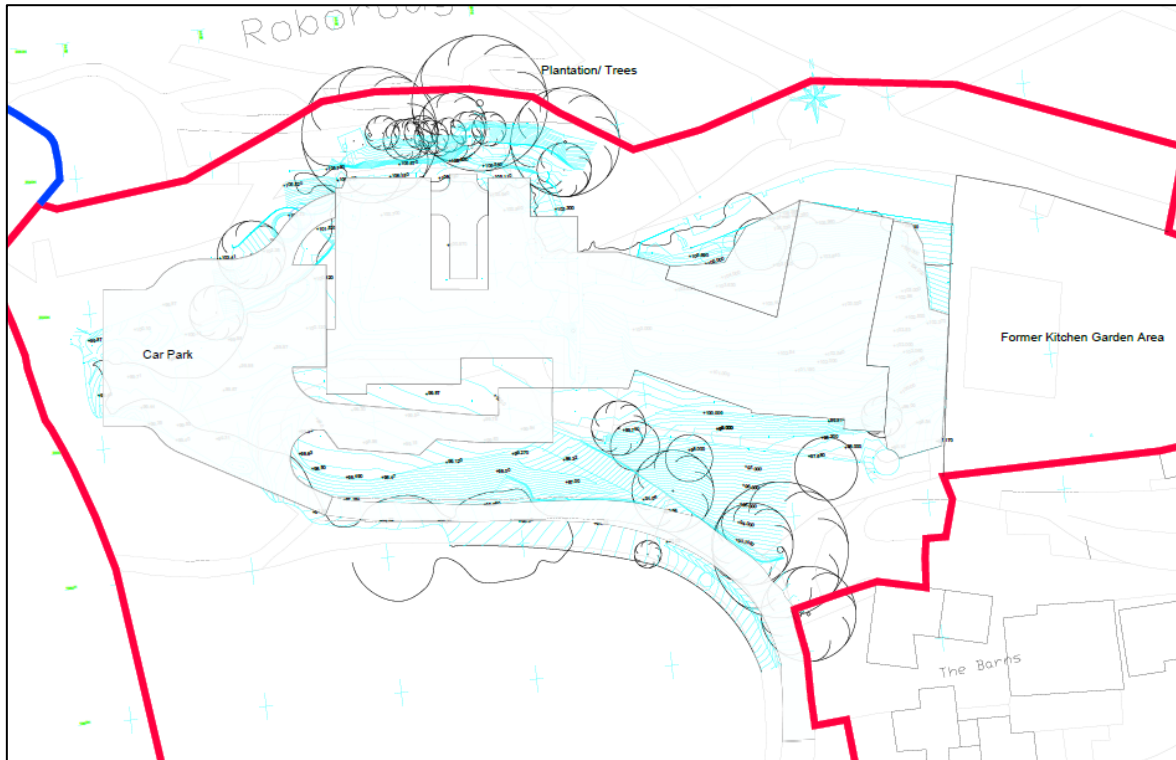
PROPOSED LAYOUT OF RESIDENTIAL CARE HOME OVERLAIN ON EXISTING GROUND PLAN (SUPPLIED BY CLIENT)
